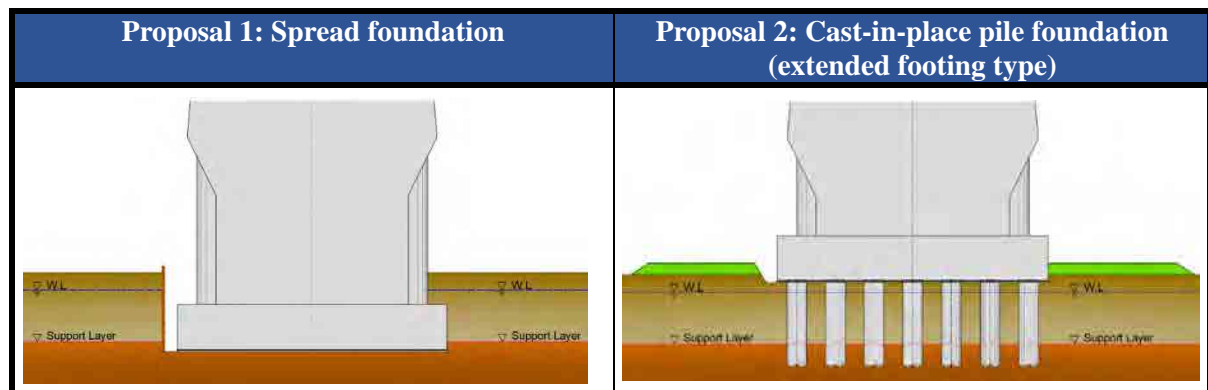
Structure of Foundations for Right Bank Main Bridge Main Tower
